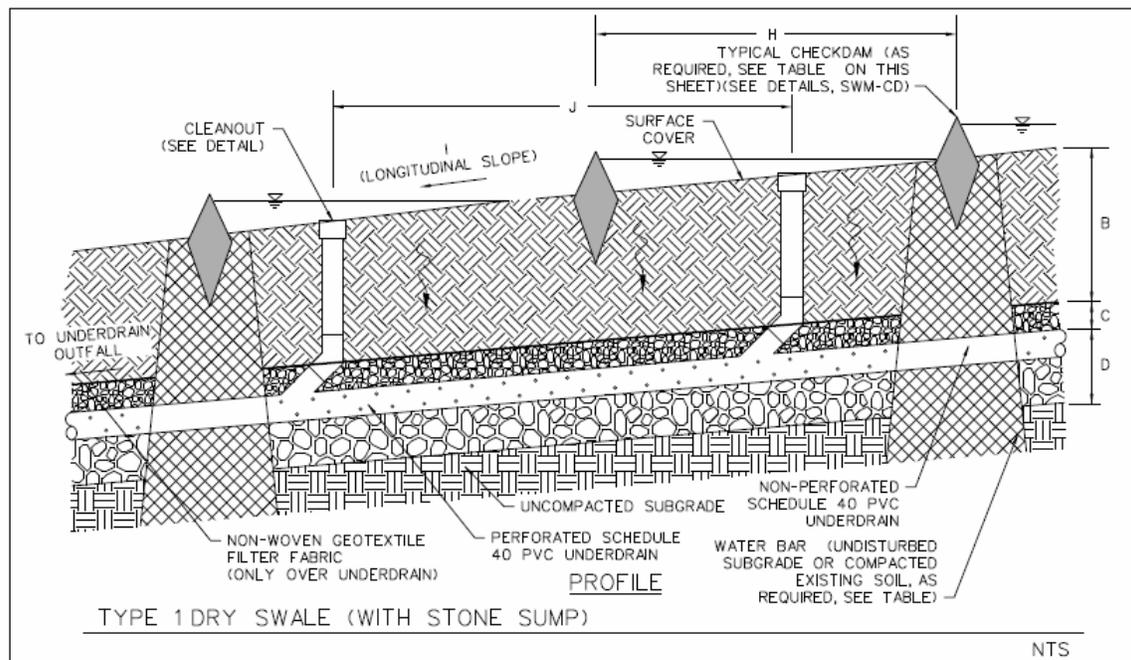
Typical Dry Swale – Level 2 [Profile View]
